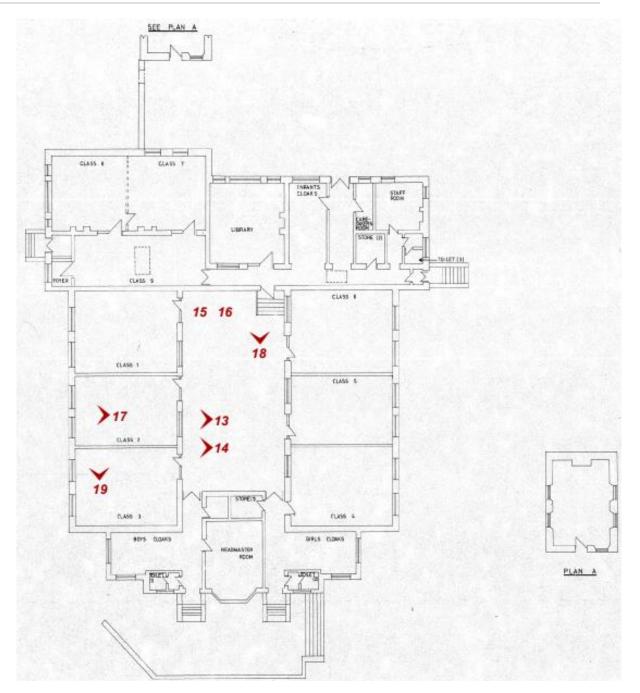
Location of interior photographs, shown on plan of school interior prior to rear (south-west) extension.
